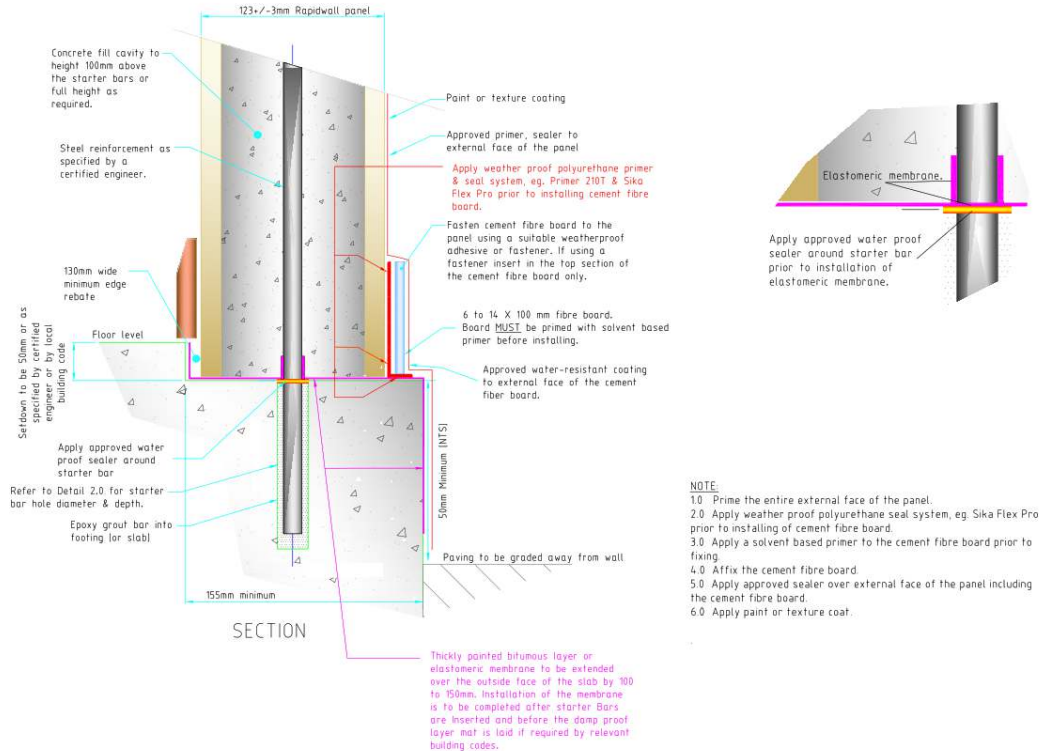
Concrete filled Rapidwall External wall to footing connection option 3 of 3
